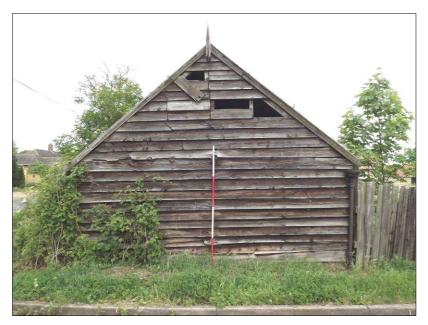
(Shot 13): Building D, south elevation, looking north-northwest. 2m scale
